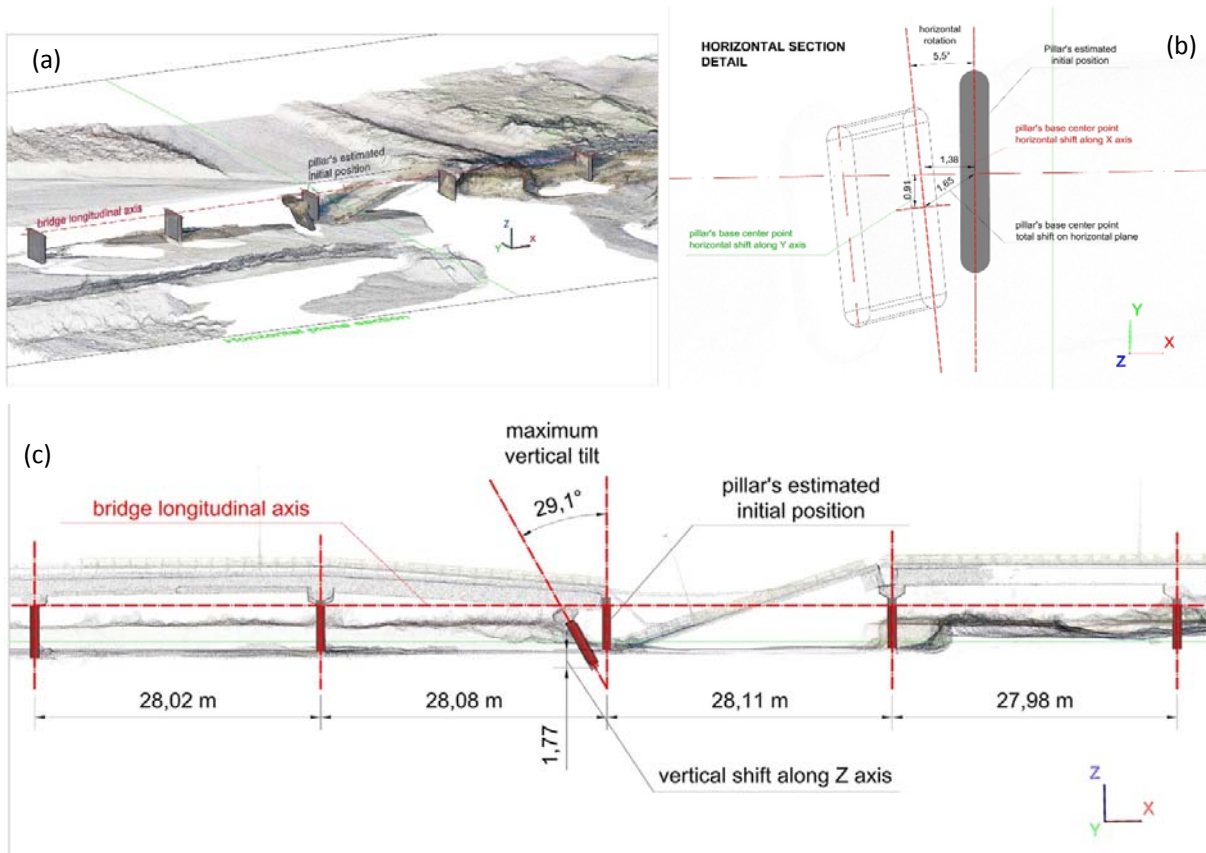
Cross-sections through the 3D point cloud model of Diavas Bridge: (a) horizontal, longitudinal section through the bridge; (b) horizontal section through the displaced bridge pier; and (c) vertical, longitudinal section through the bridge.
